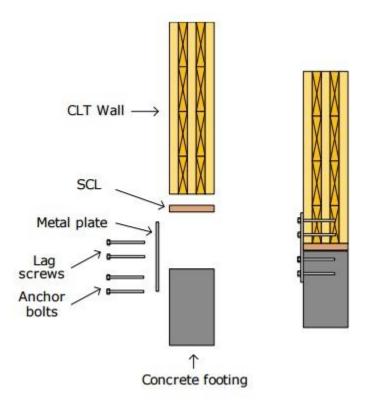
Wall-to-Foundation Example (Karavabeyli and Douglas, 2013)
